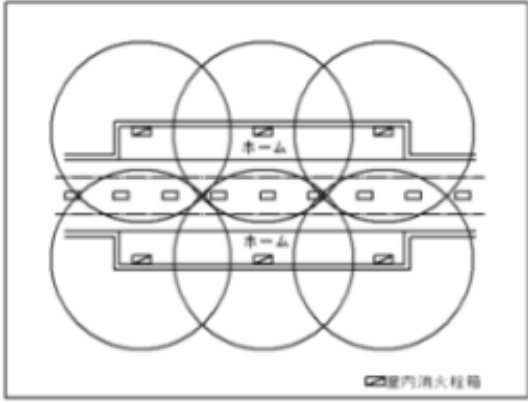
An example of installation of interior fire hydrant boxes in a platform
